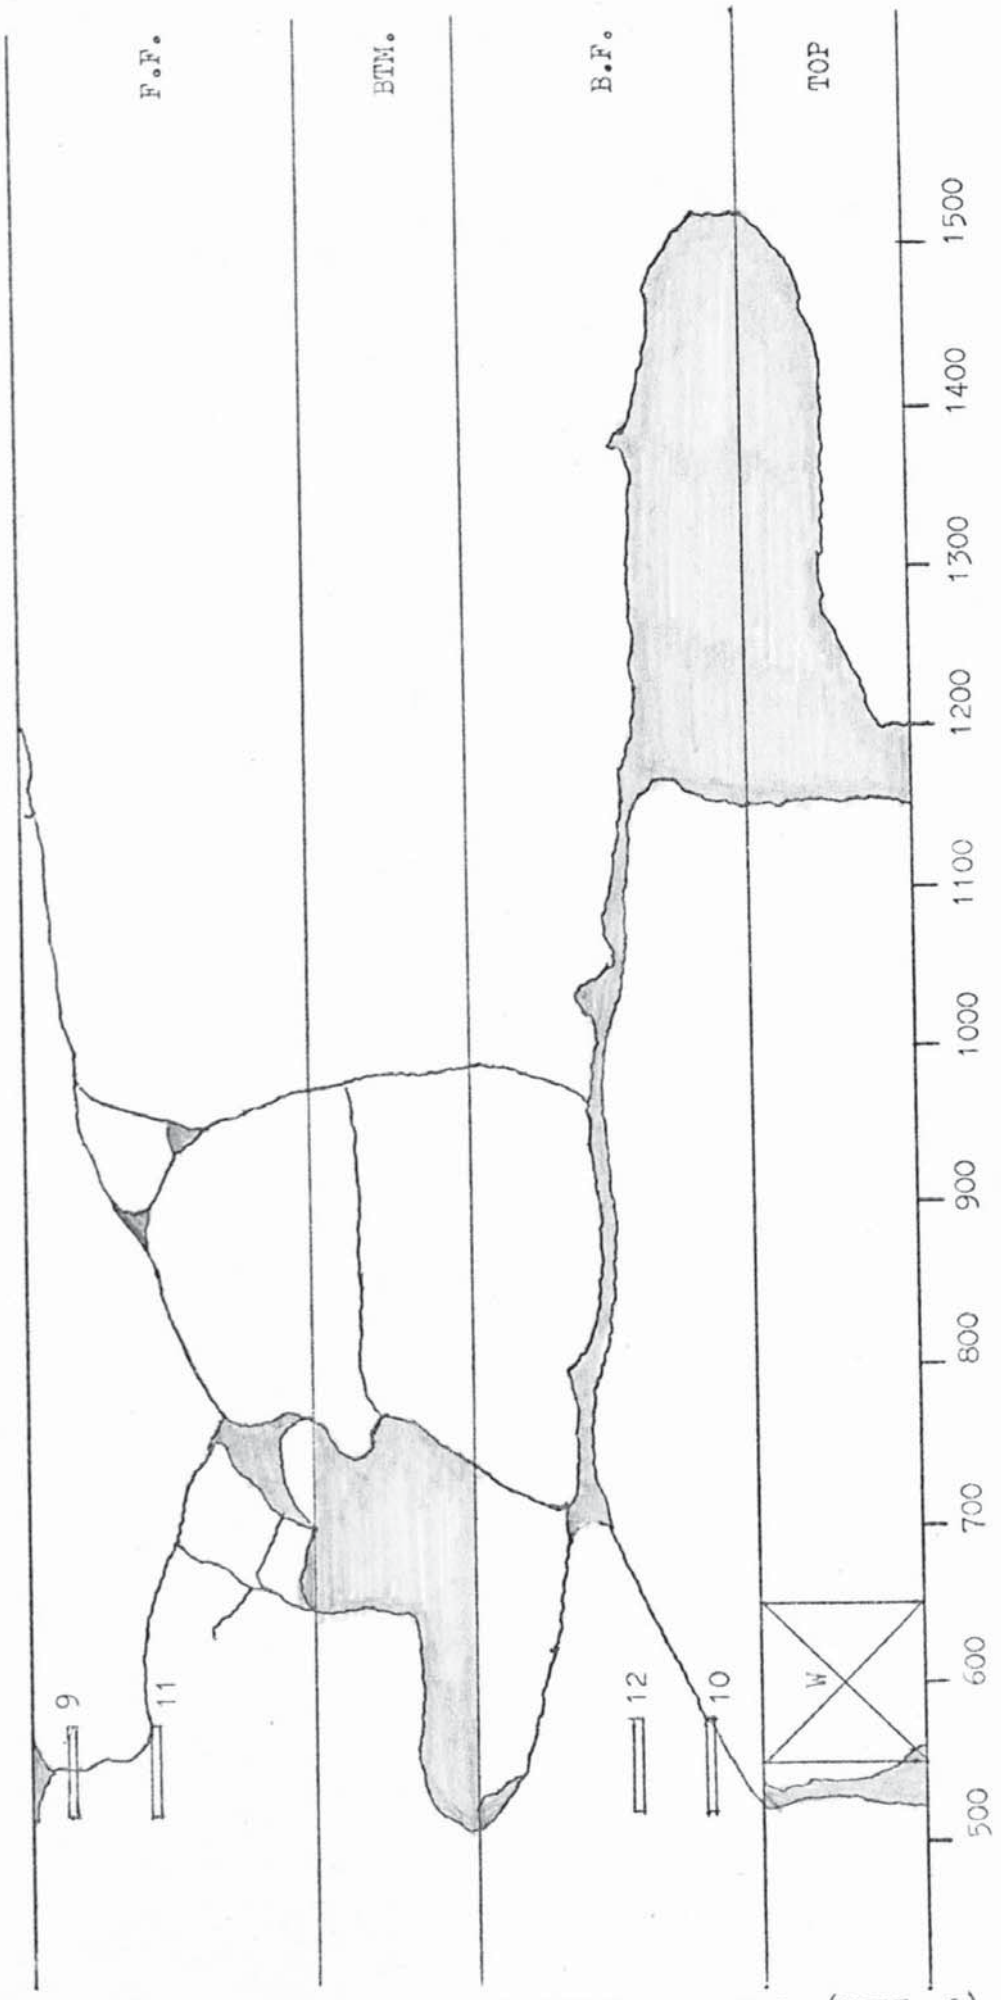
FAILURE CRACK PATTERNS - BEAM 2 (MODE 2)
